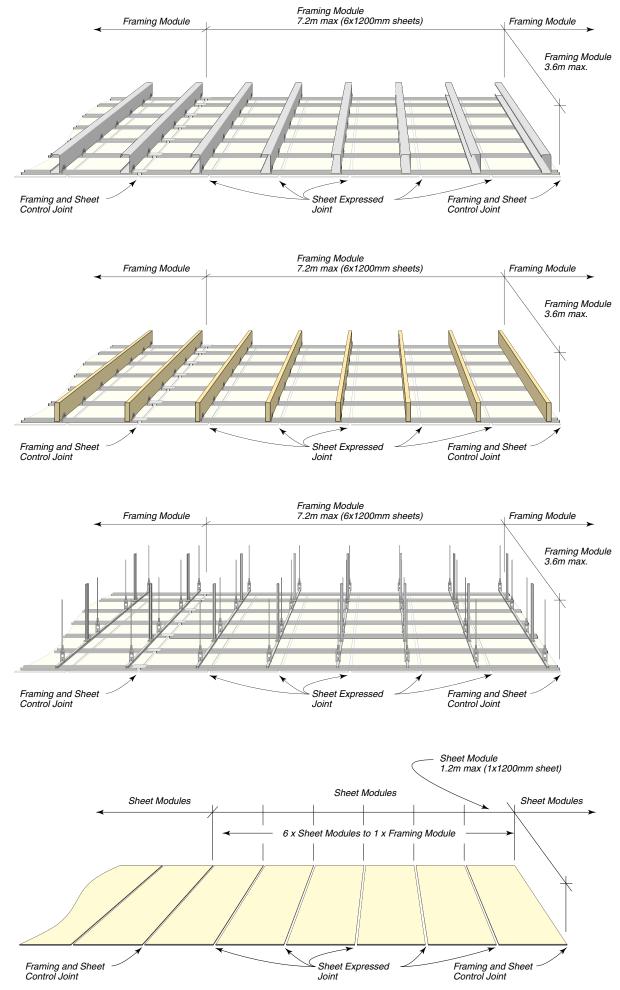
Typical Layout for External Ceiling with Expressed Joints
